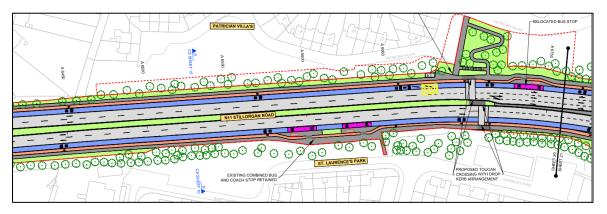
Extract from General Arrangement Drawings (Sheet 20)
